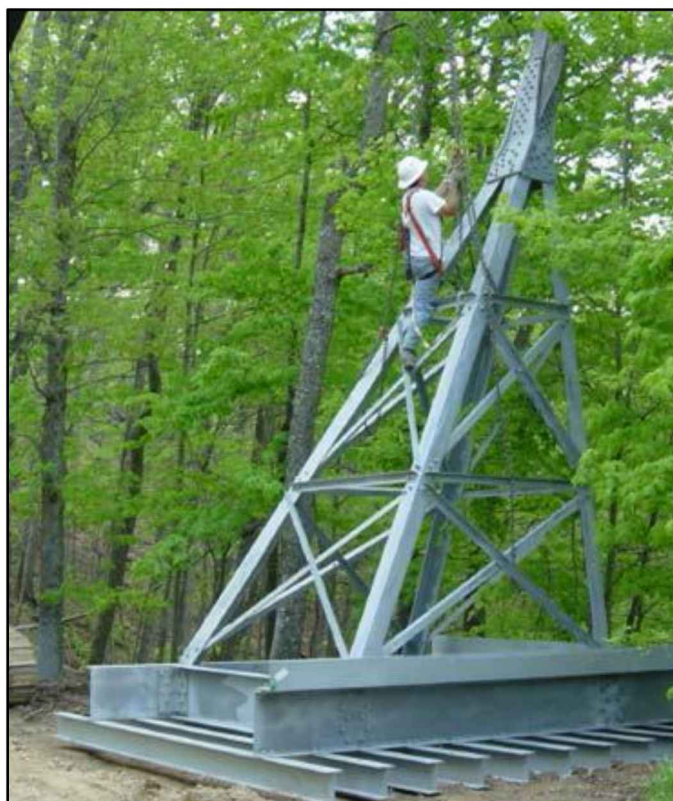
Steel Grillage Foundation Supporting Lattice Tower (EPRI, 2012).
